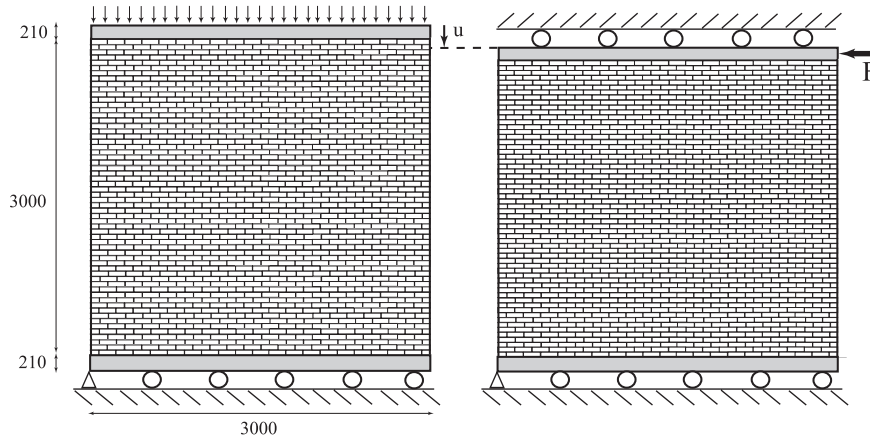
Shear test on a full masonry wall: two-phase loading and dimensions
